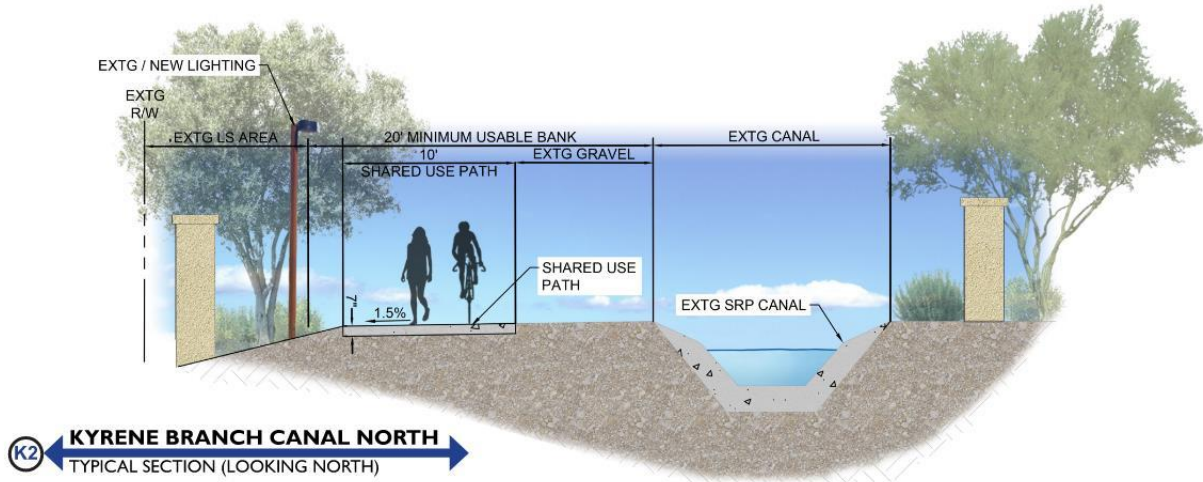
Shared Use Pathway Typical Section - Kyrene Branch Canal North - Segment K2
